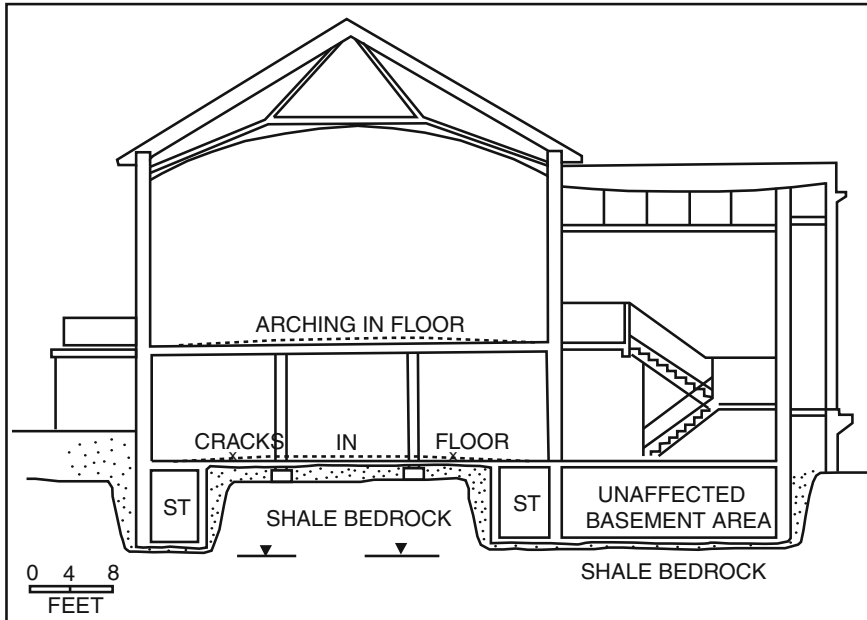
Cross-section of Rideau Veteran's Home illustrating heave in the ground and second floor slabs (from Quigley and Vogan 1969)
